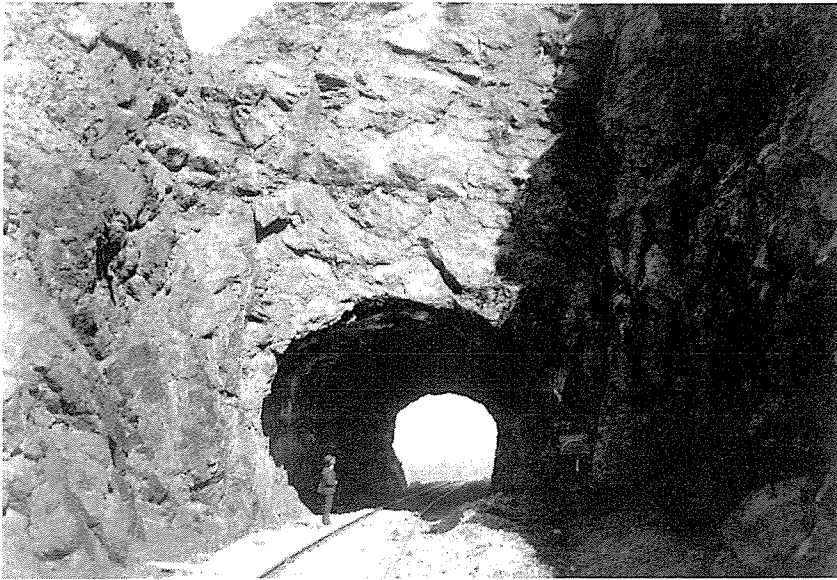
Morrissey Rock Tunnel (Circa 1875, National Archives).
